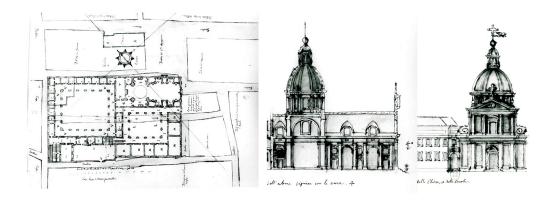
Church of Santa Margherita by Agazio Stoia (1625): ground floor plan [pen and sanguigna, 46,5x35,5. Bibliothèque Nationale de Paris, Hd-4, 71, JVR 90] and project of the church in section and elevation [extracts from the drawings JVR 90 e 95].
